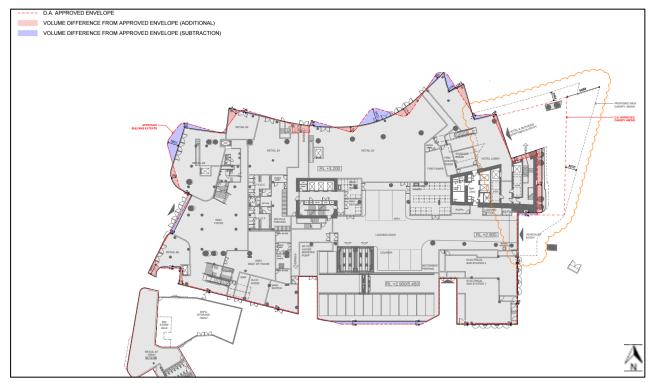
Proposed ground floor and podium building footprint (Source: modification application)
